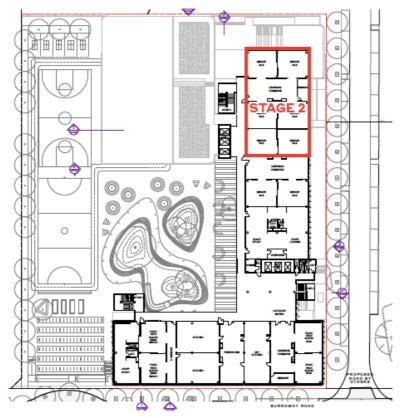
Staging plan – Level 5 Source: Wood Bagot
